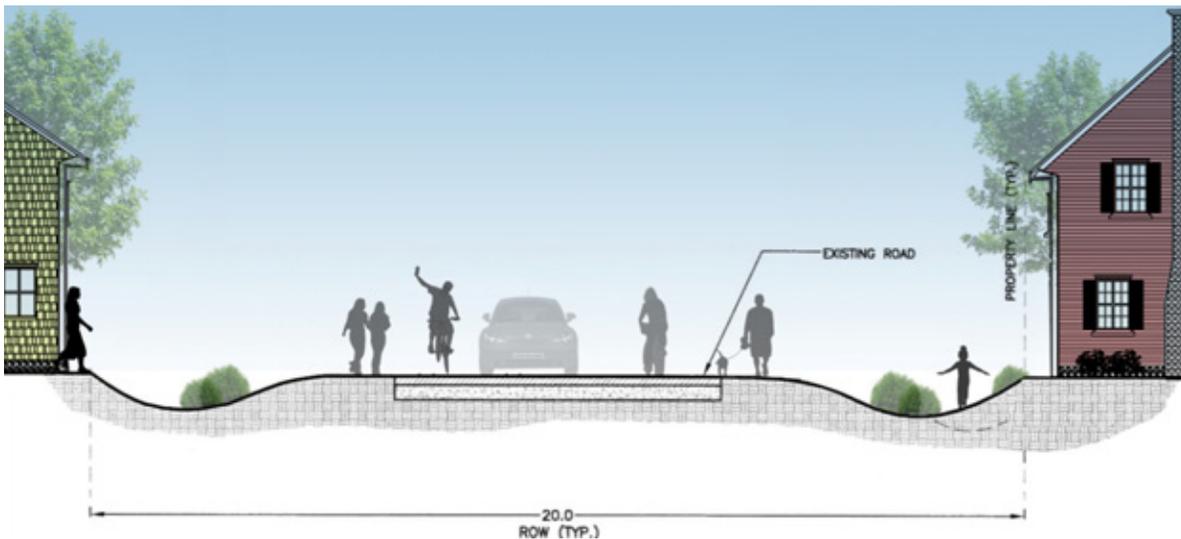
Cross Section of Designated Shared Road in Rural Area
